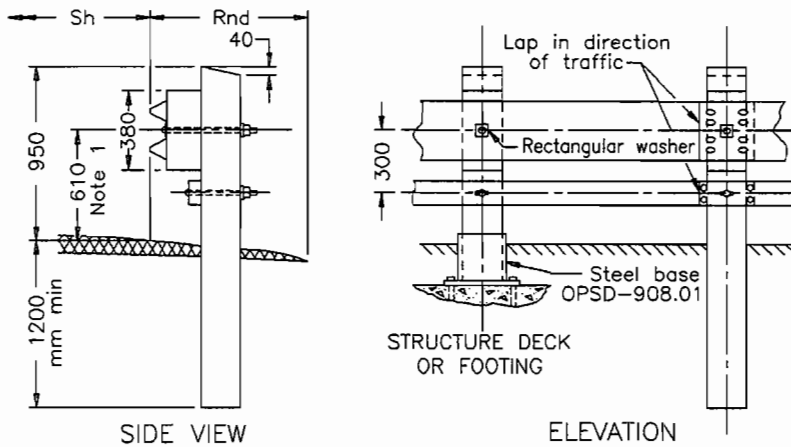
Steel Beam Guide Rail Single Rail With Channel
